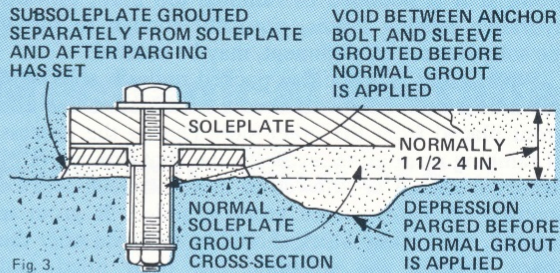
Deep depressions in the concrete should be parged with grout before subsoleplate and soleplate are grouted. It is especially important to grout the void between anchor bolts and poured-in sleeves or surrounding concrete (for drilled-in holes) before grouting of subsoleplate and soleplate.
